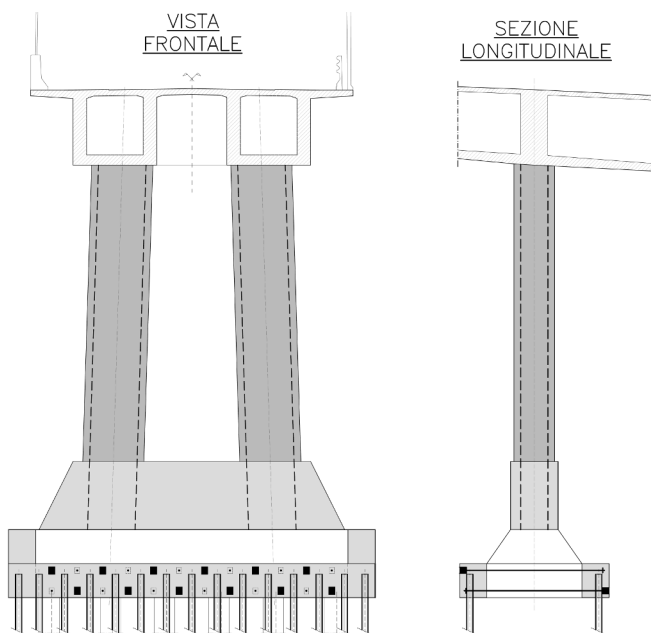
Reinforcement intervention on pile P28 / Intervento di rinforzo su pila P28.
